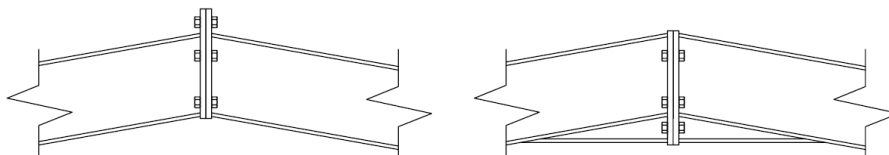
Elevation layouts of extended endplates and haunches used on apex or ridge connections respectively.
